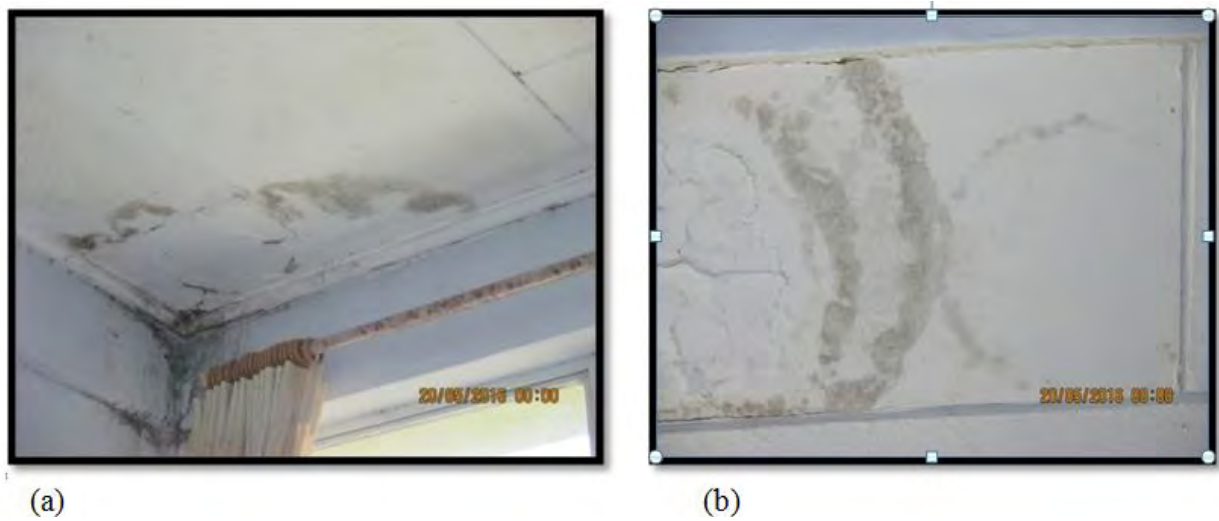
(a and b) Leaking on Roof Ceiling and Top Slab Respectively
